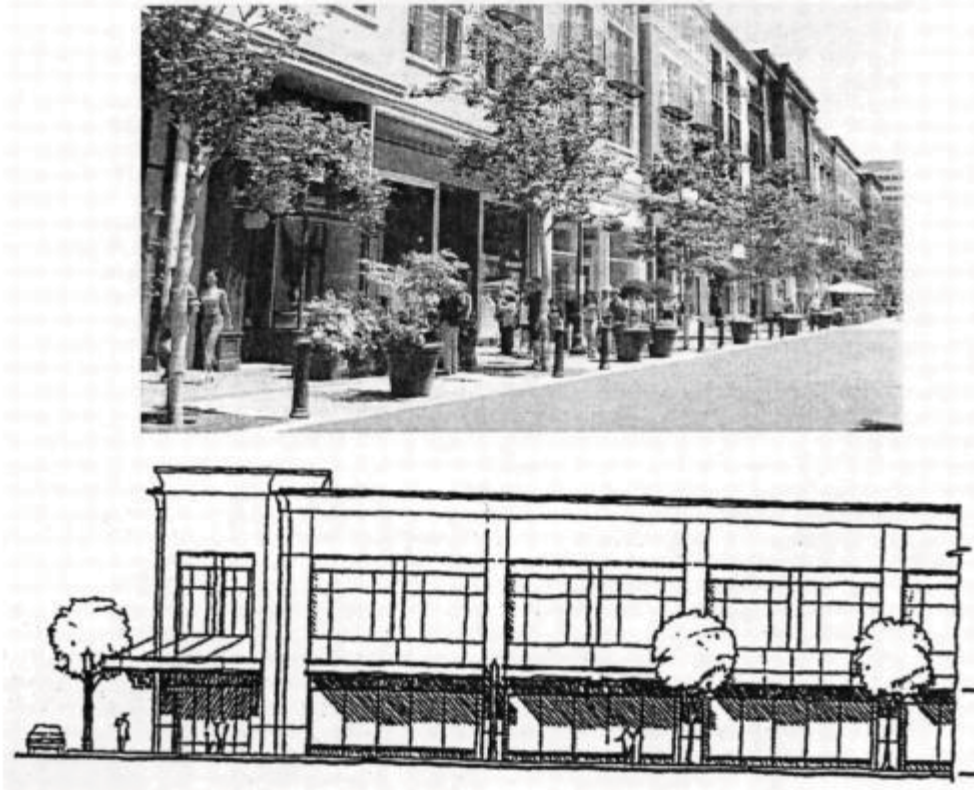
EXAMPLES OF GROUND FLOOR TRANSPARENCY
